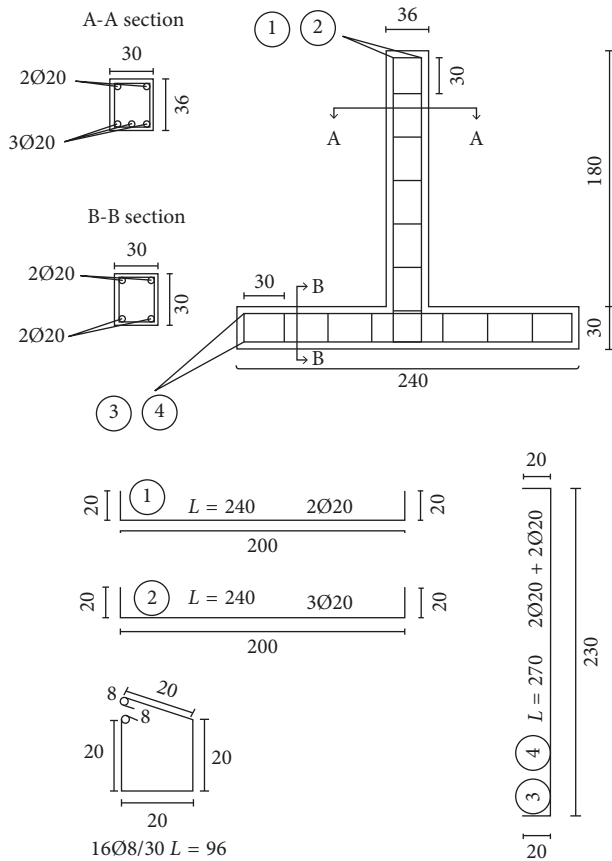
Design of reinforced concrete beam-column for Samples 1 to 4.
